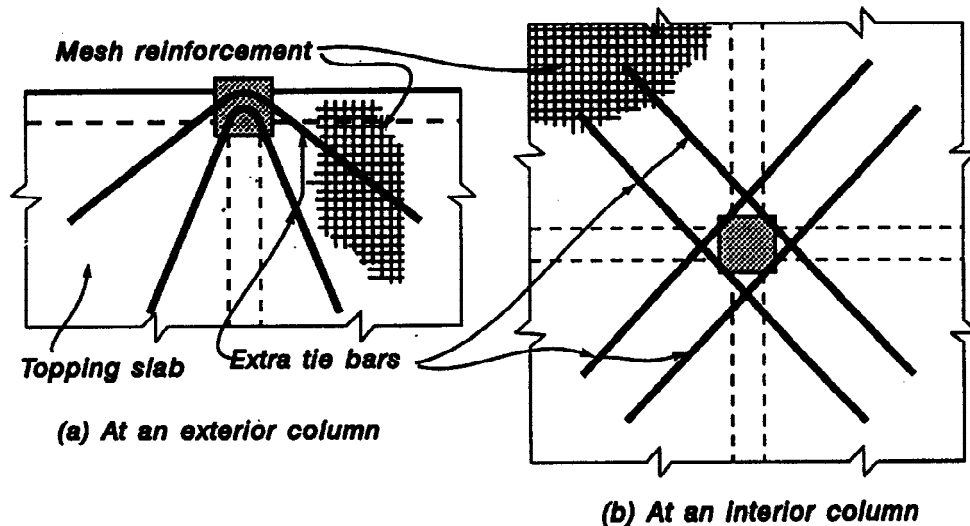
Additional reinforcement recommended to develop a diagonal tension field in the topping of a precast floor system.
